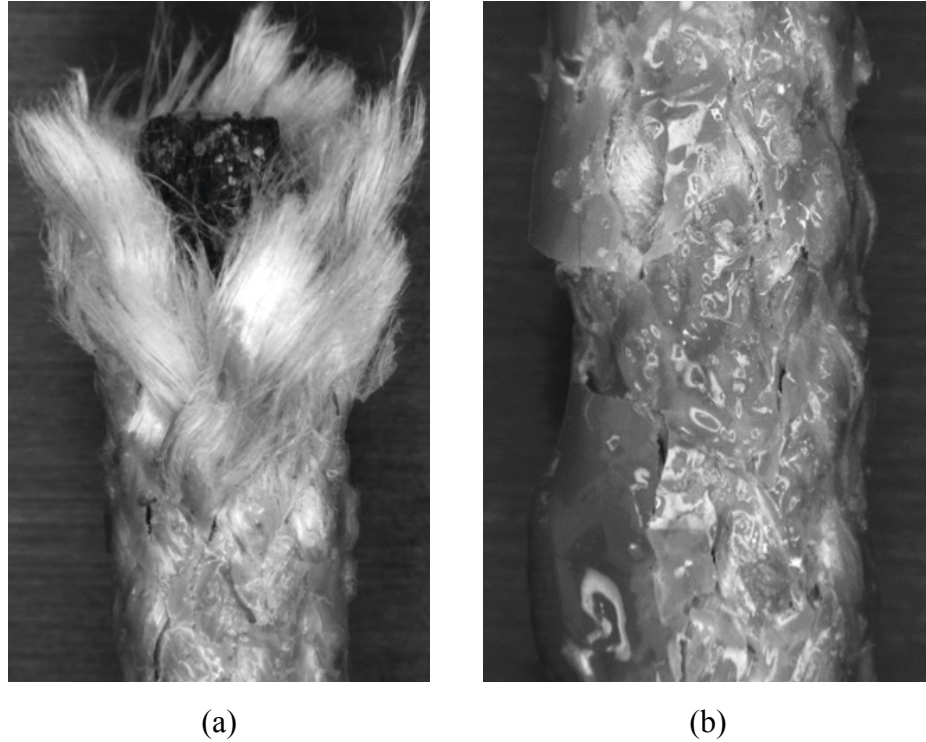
(a) Closeup of failure site, showing clean fracture of core and relatively dry braid yarns after failure, (b) close-up of rebar surface near failure site showing extensive matrix cracking
